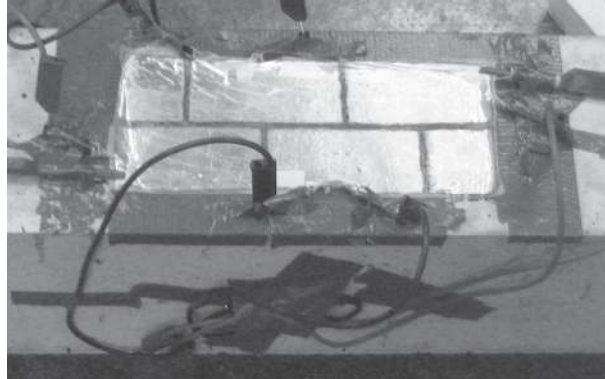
100 x 200 mm sheet of sensors deployed on the surface of a concrete beam.
